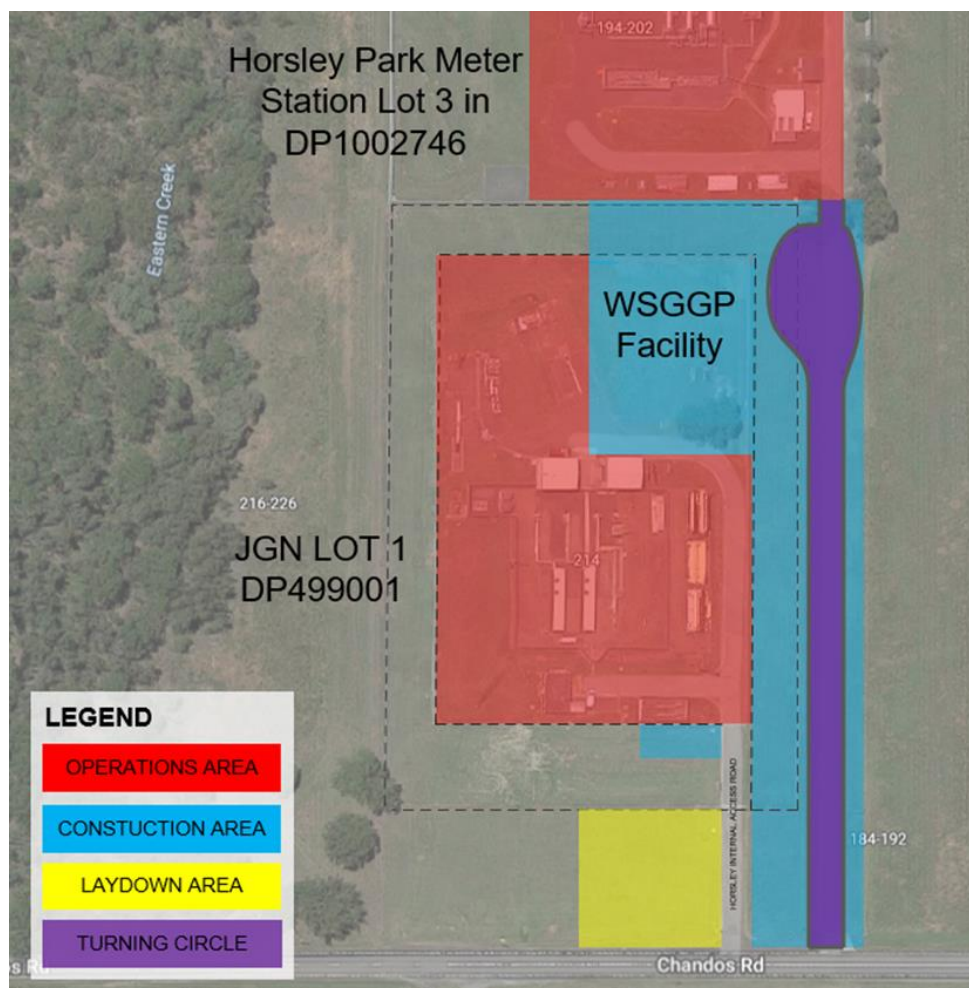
WSGGP Facility Location (within existing Horsley Park Site)
